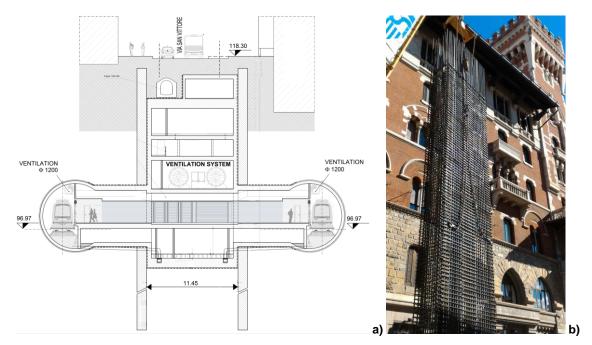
a) Sant'Ambrogio deep station - interconnection with Line 2; b) detail of the reinforced cage
